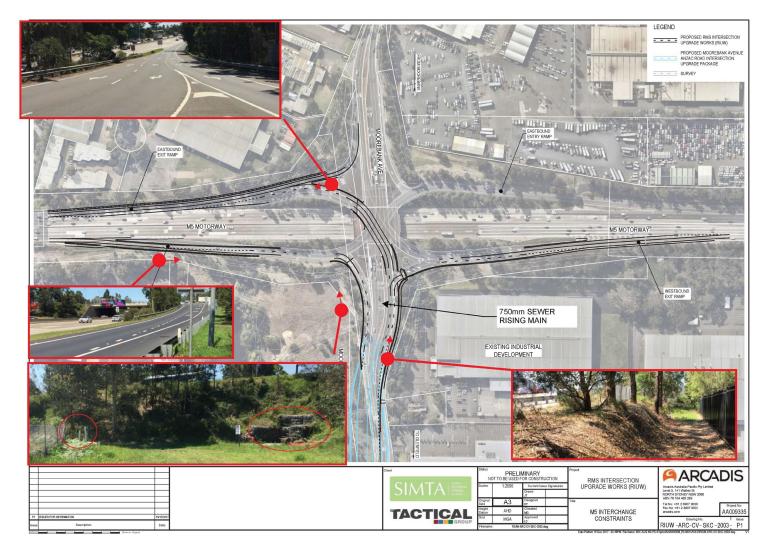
Indicative Layout Plan - Moorebank Avenue Road Upgrade near M5
